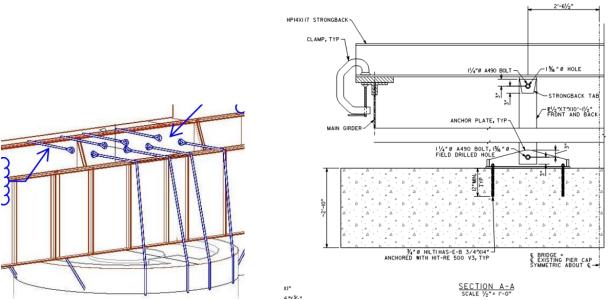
Conceptual Basket Hanger System (left) and Strong Back Beam and Anchor Plate System (right) -Heath & Lineback Engineers
